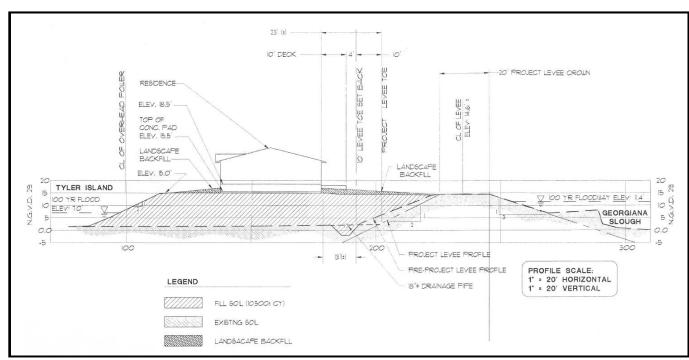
Cross Section of levee and fill (prepared by DCC Engineering dated 09.02.2009)
